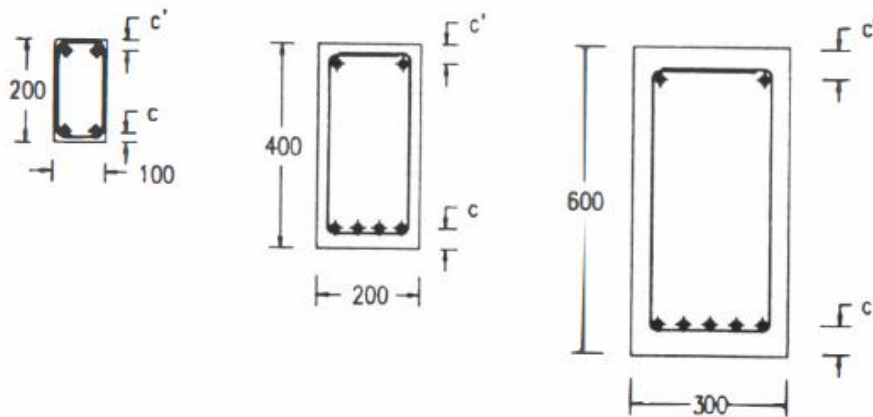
Bosco Debernardi Beam test Cross section and steel bars configuration
